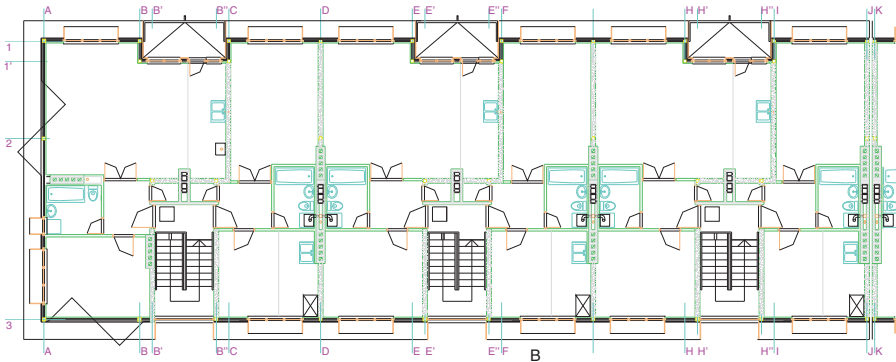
Typical multistory masonry building (Groundfloor + four or five stories), regular structure
